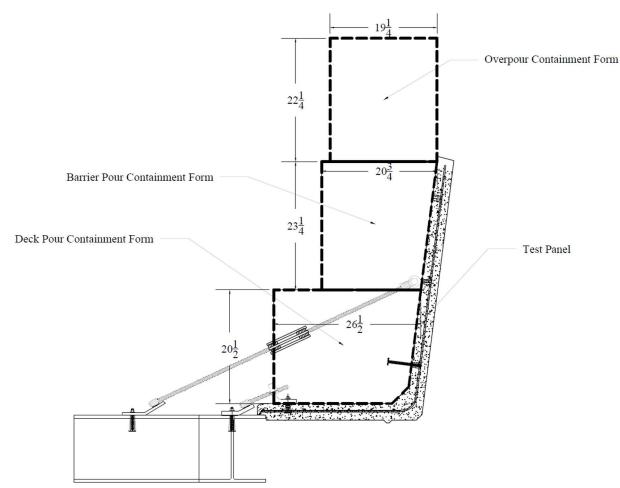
Containment Form dimensions for all Load Conditions (dimensions in inches)
